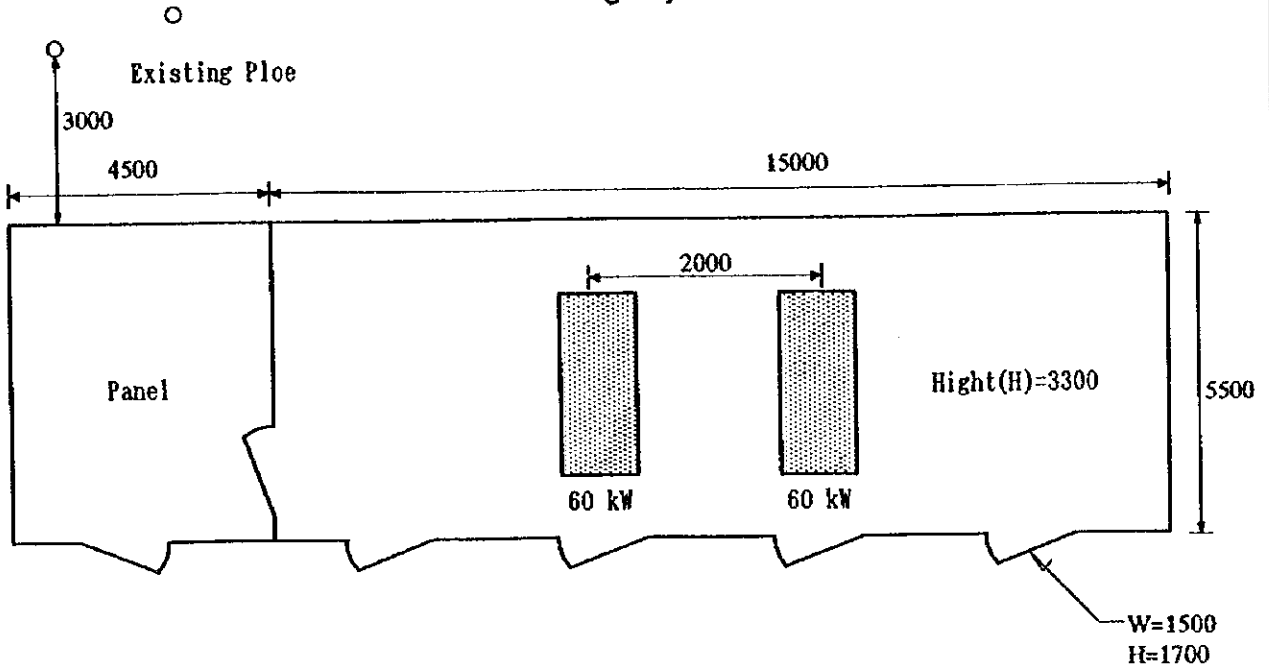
38 Layout Drawing of Erdenetsagaan
